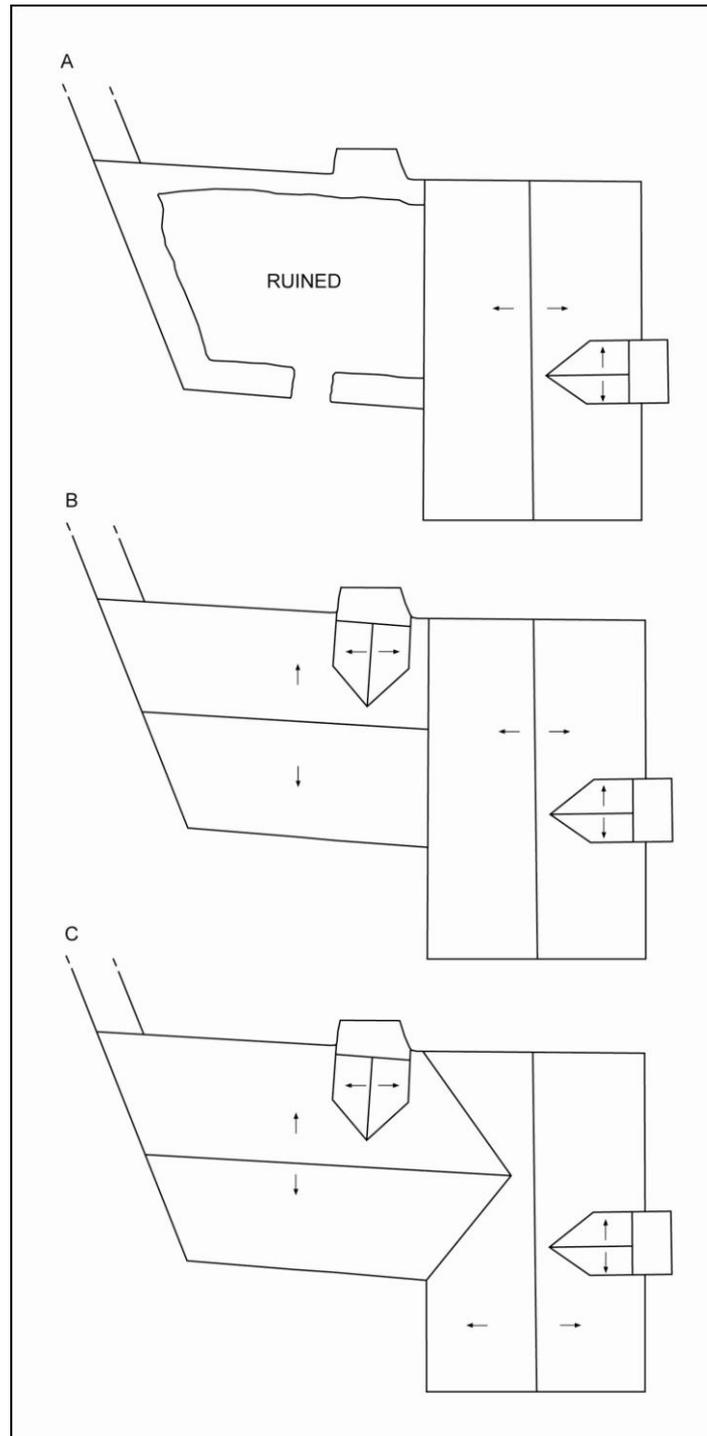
Three conjectural plans of the roofing arrangements for the final phase of Blundell's House.
